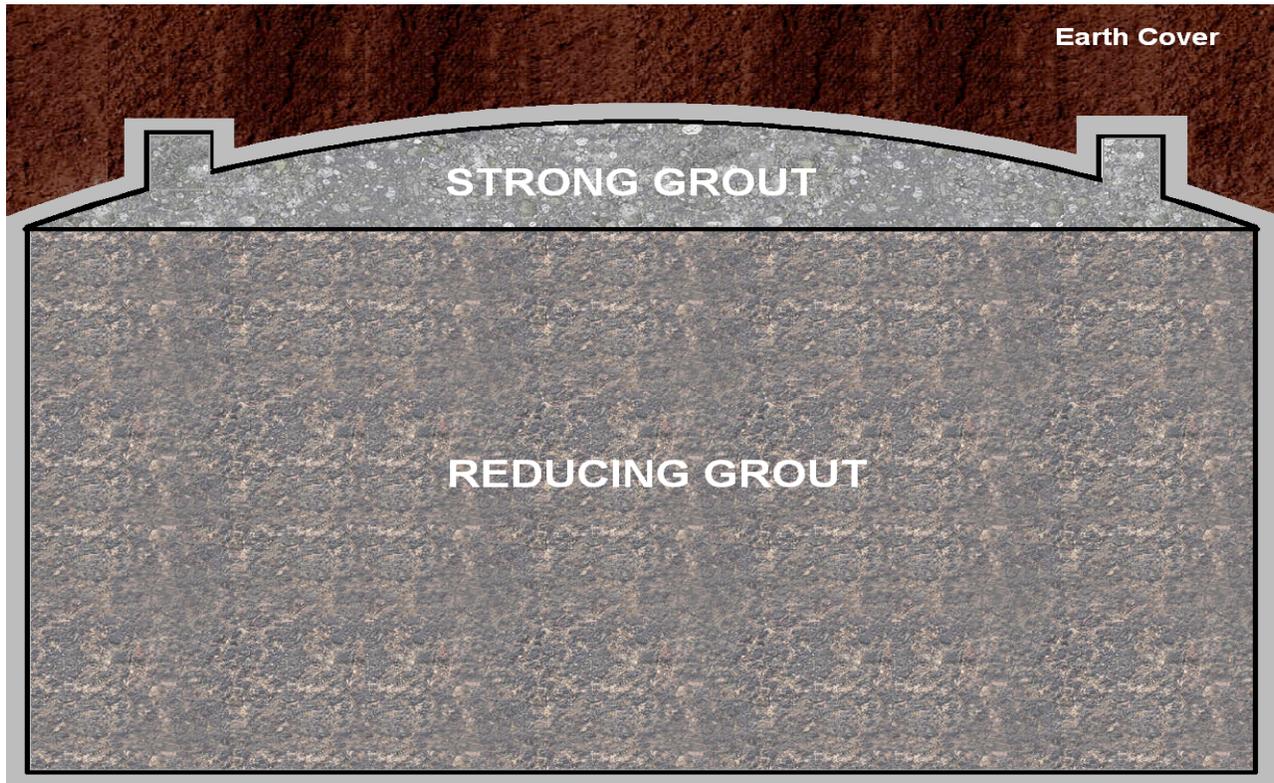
Typical Type IV Tank Grouting Configuration
